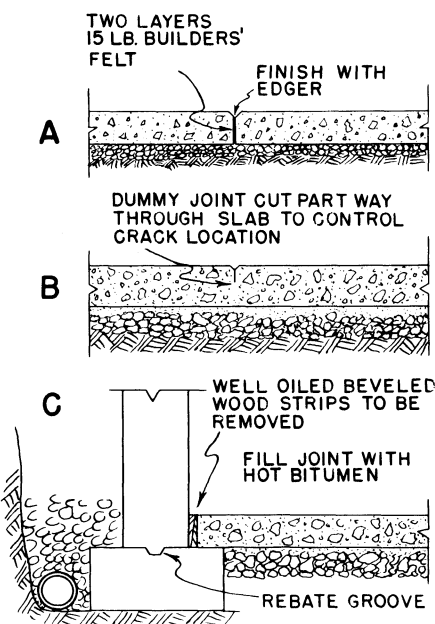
Joints for concrete slabs: *A*, Joint between concrete blocks or strips in slab; *B*, “dummy” joint to control cracking; *C*, joint between slab and wall. Rebate grooves are used to bond sections of concrete.
